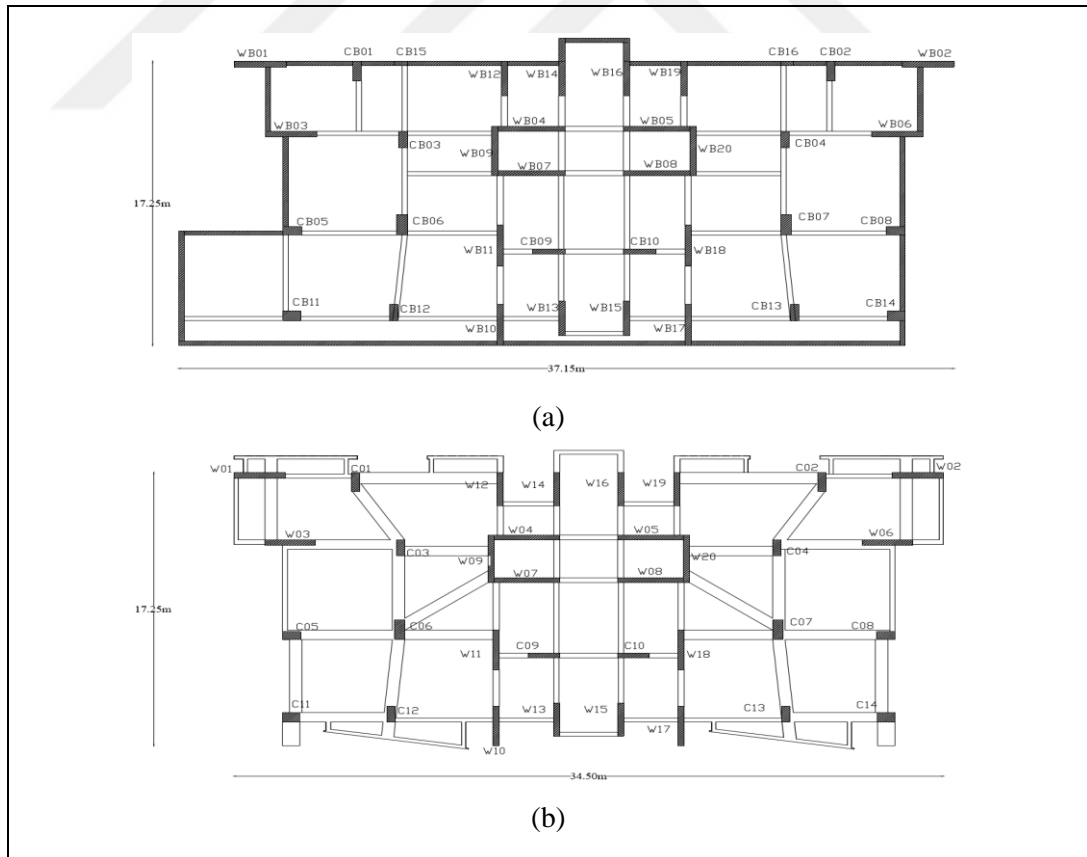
(a) The basement plan and (b) the typical floor of the building.
